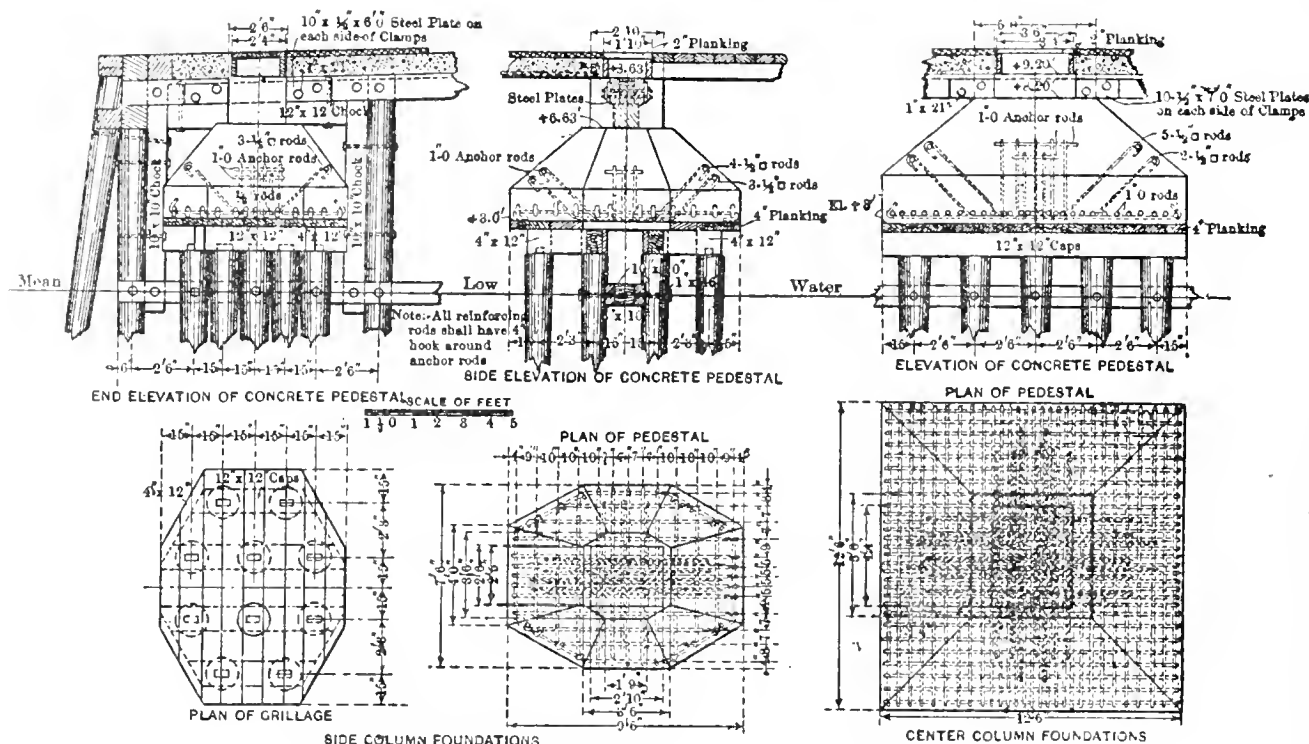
Details of Reinforced Concrete Deck and Column Pedestals, Two-Story Shed.
